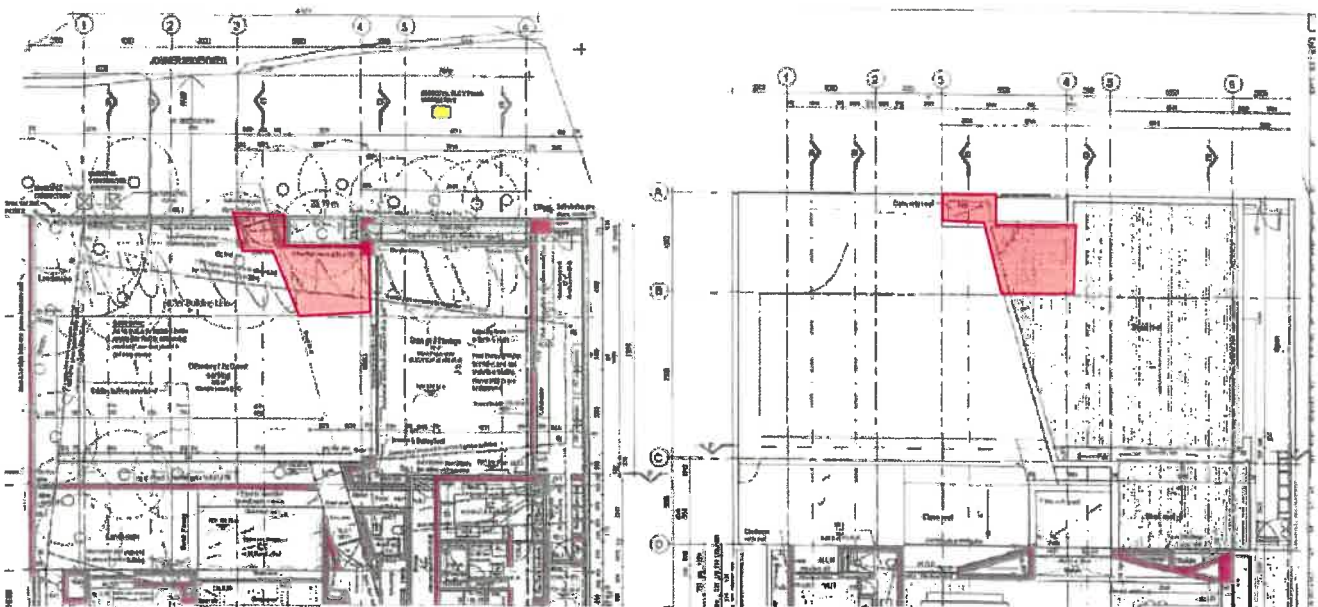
Roofed entrance and portion of covered walk-way falling within 4m street building line (extracted from previous land use approval, dated April 2012)
